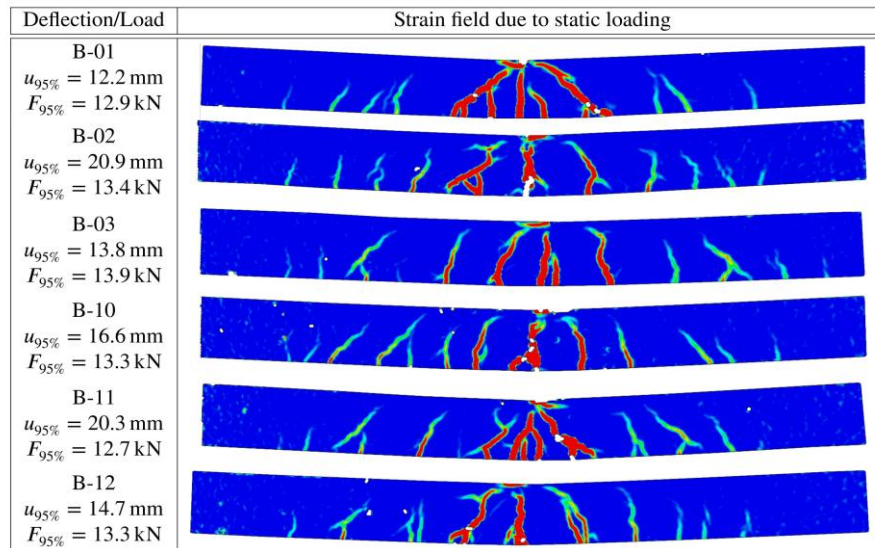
Crack patterns for static loading after subjected to impact loading, Series-1, drop height $h = 2.5 \text{ m}$.
